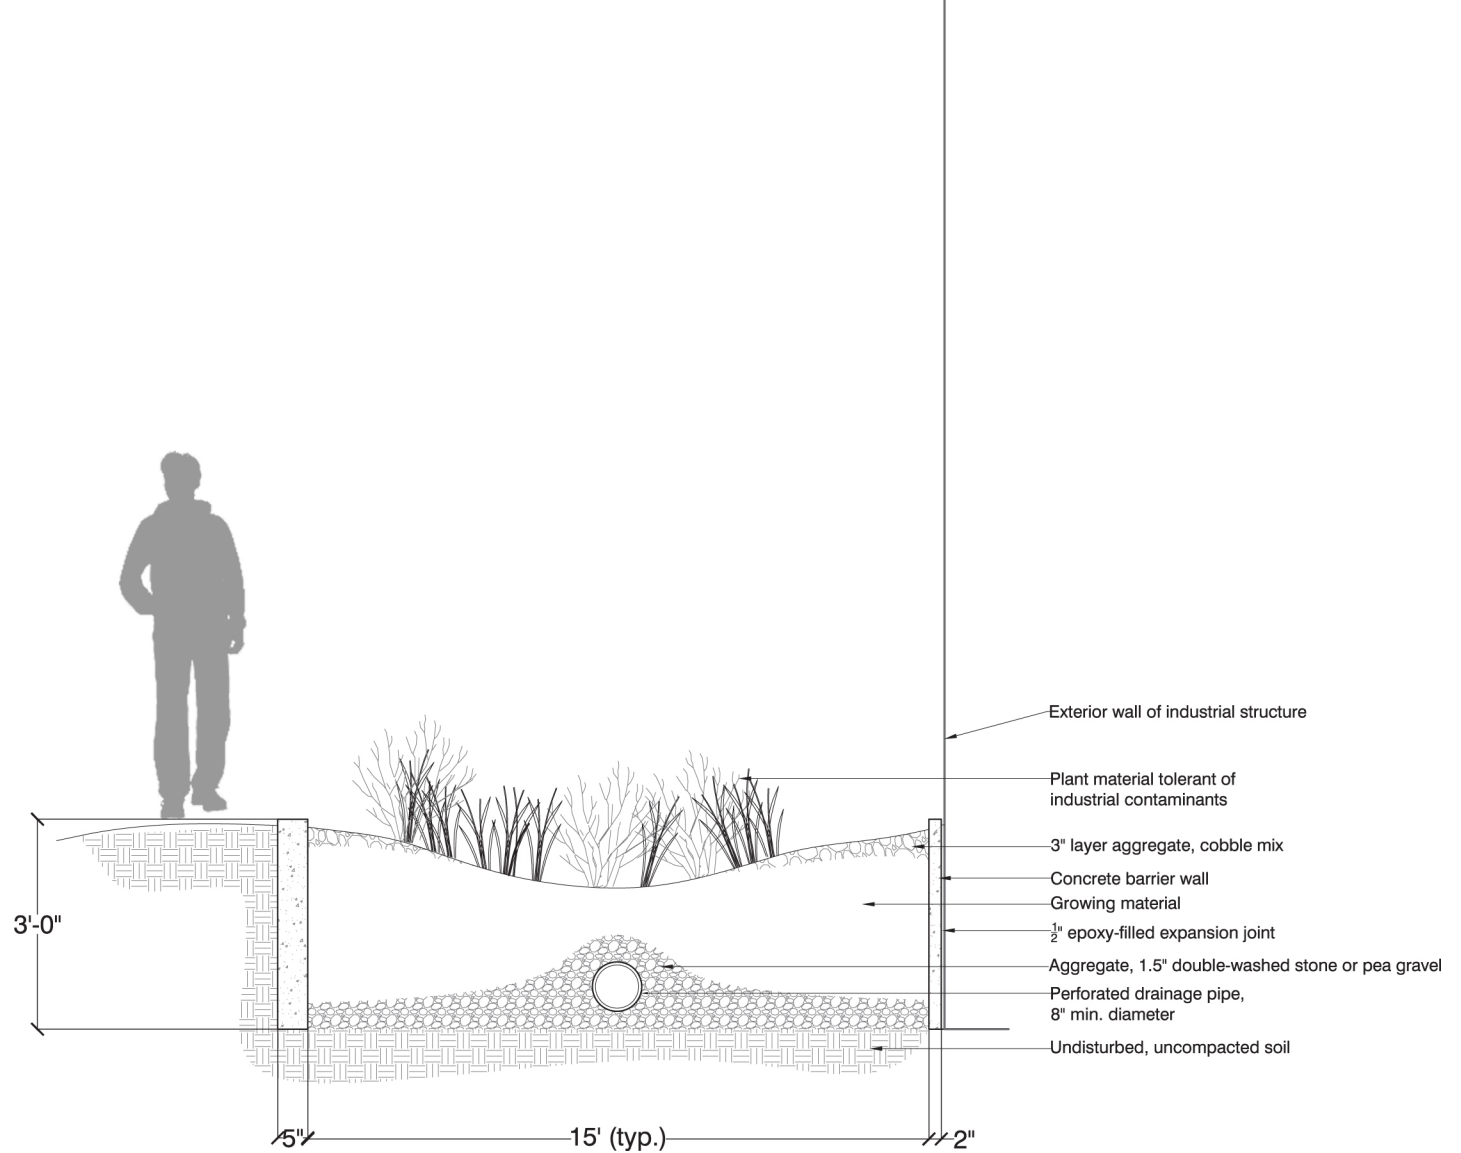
explains how the planting should be completed on the site. This is important due to the sheer amount of planting needed. Figure 35 explains how the area immediately surrounding existing industrial structures may be treated. It is important to provide for park users' safety. Because of this, a planted border lined with heavy cobbles or aggregate may be the best and most aesthetically-pleasing alternative to a fence.
